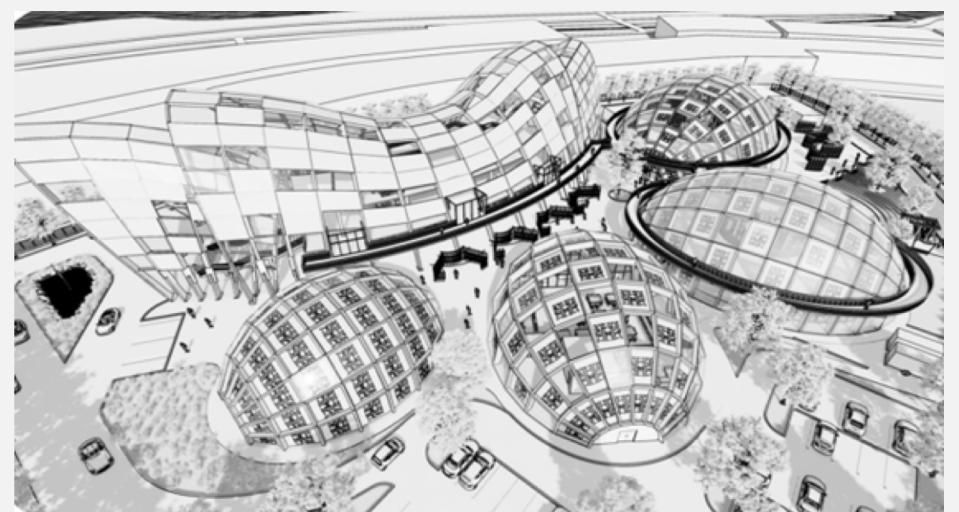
Final Design Scheme, shown in 3-dimensional Drawing
